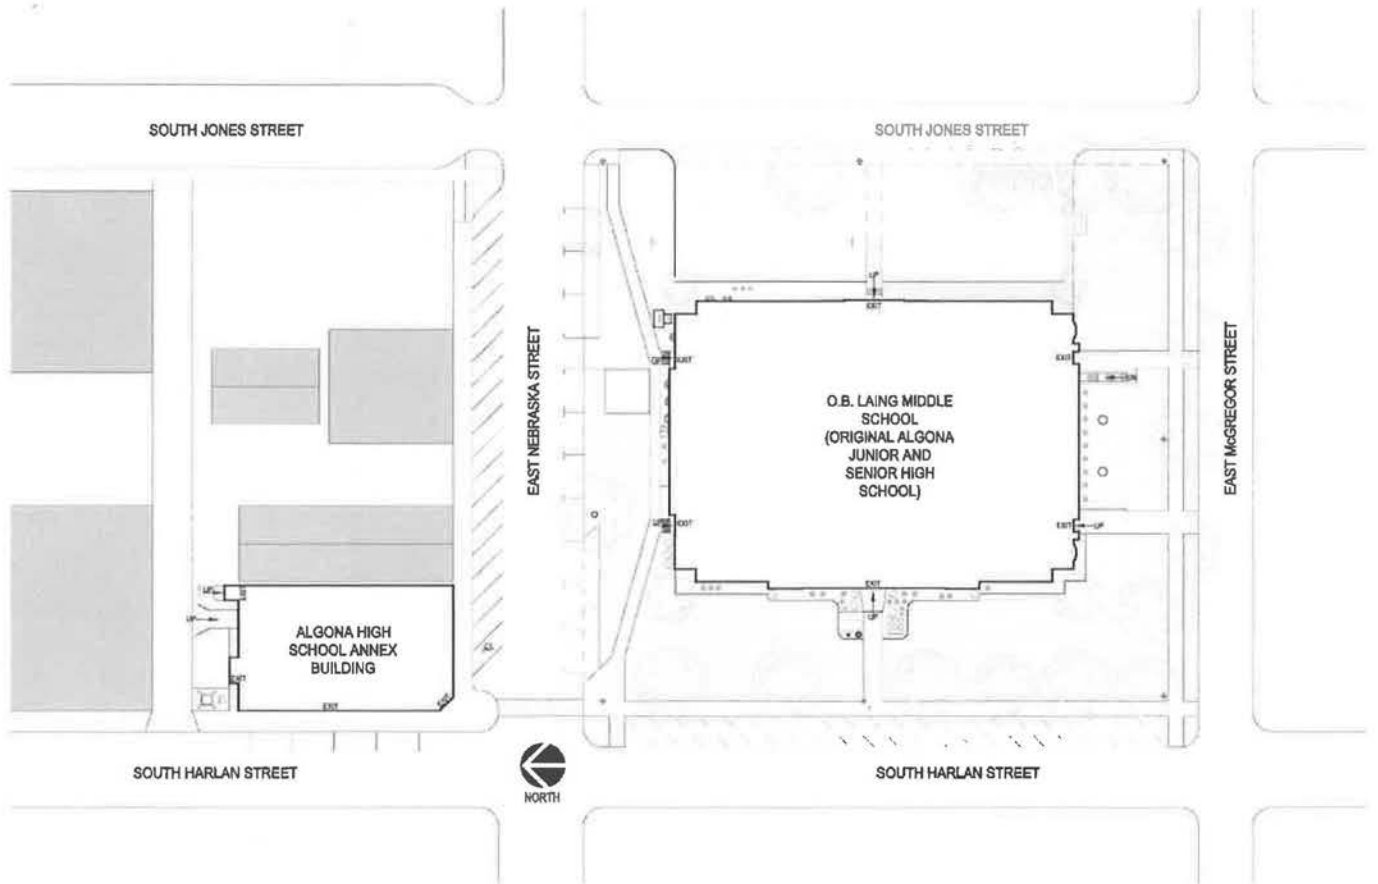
Existing Site Plan (drawn by Foutch Brothers, LLC, August 15, 2013)
